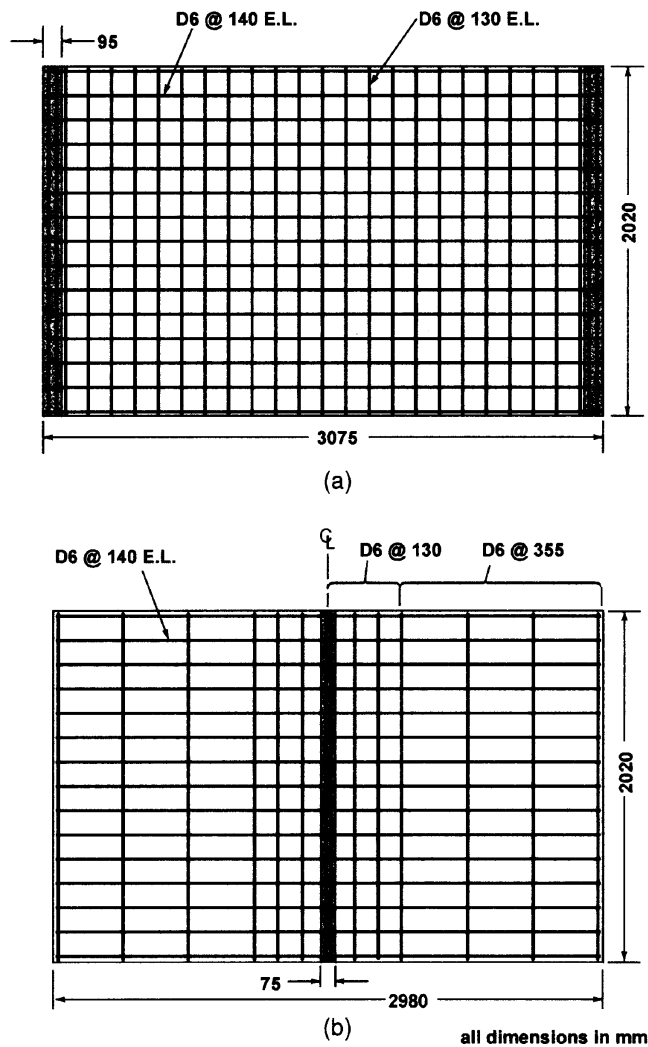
Reinforcement details of (a) web; and (b) flanges.
